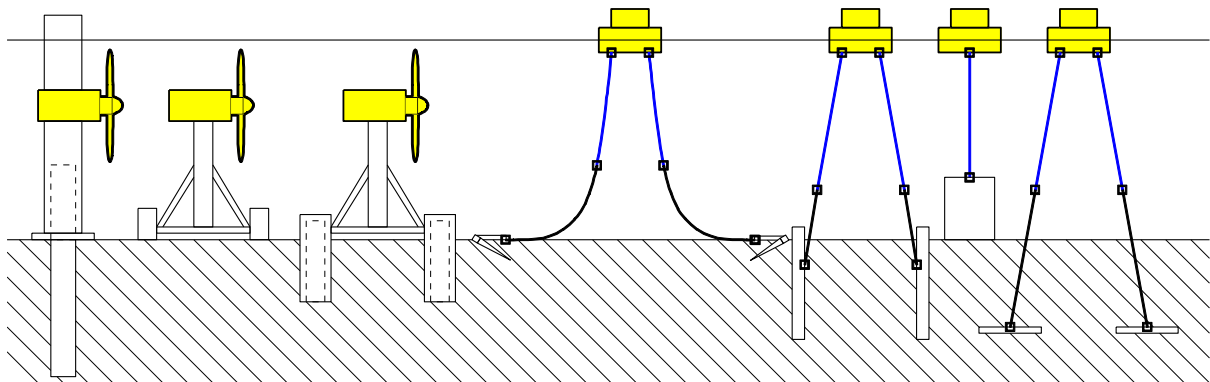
Schematic of possible foundation arrangements for MRE devices: (*from left*) piled foundation, gravity based structure, suction pile or caisson and several anchor types (fluke, pin pile, gravity and plate).
